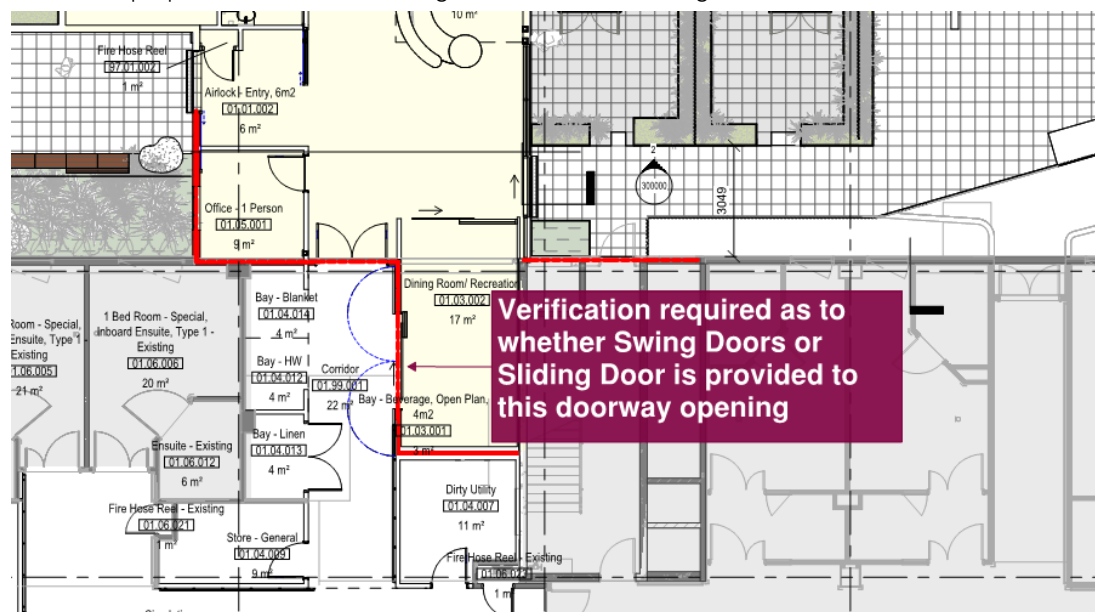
Verification required as to proposed doorway located within the fire wall
